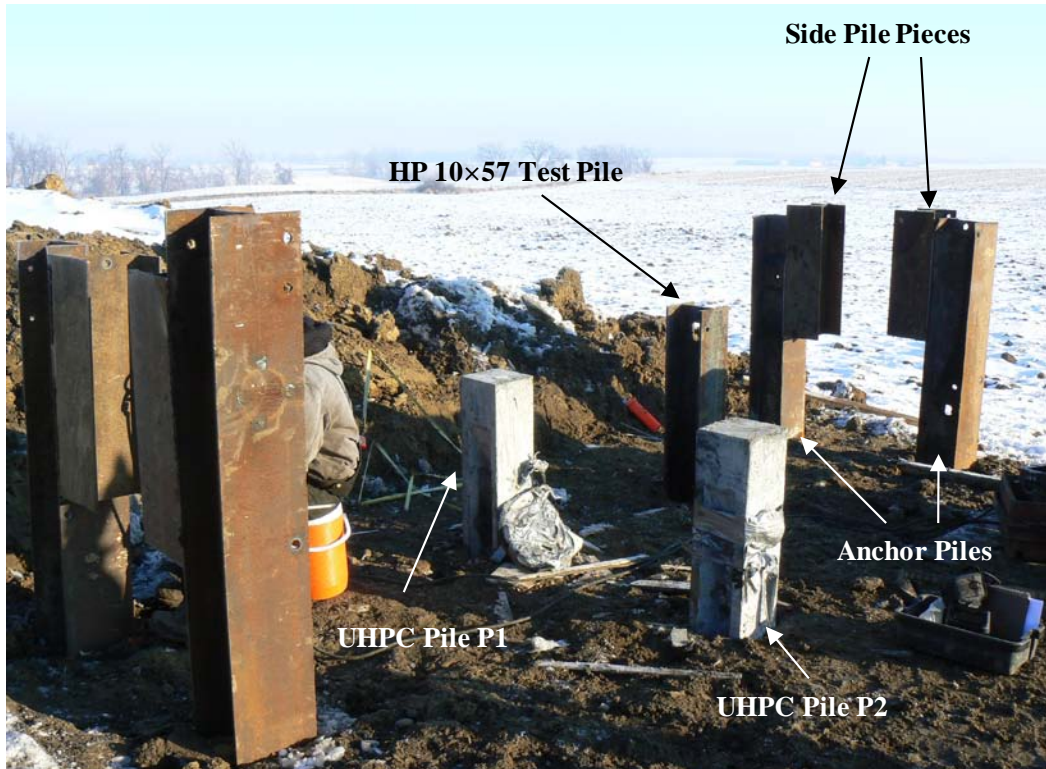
Piles at completion of driving, including side pile pieces welded onto facing flanges of anchor piles
